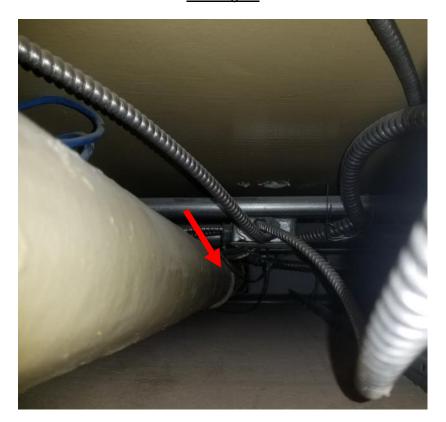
Basement, women's washroom, center of room, <1 linear metre poor condition thermal pipe insulation.
